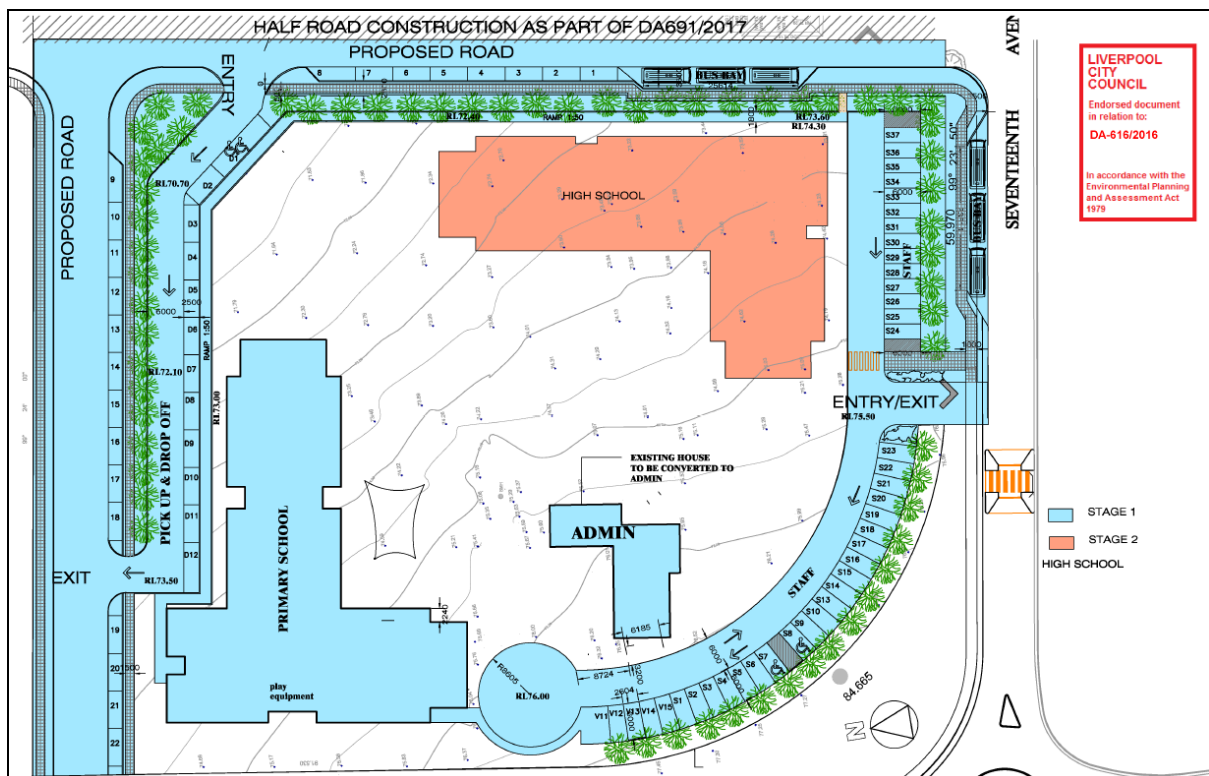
Extract of approved Stage 2 Site Plan (North to left)
